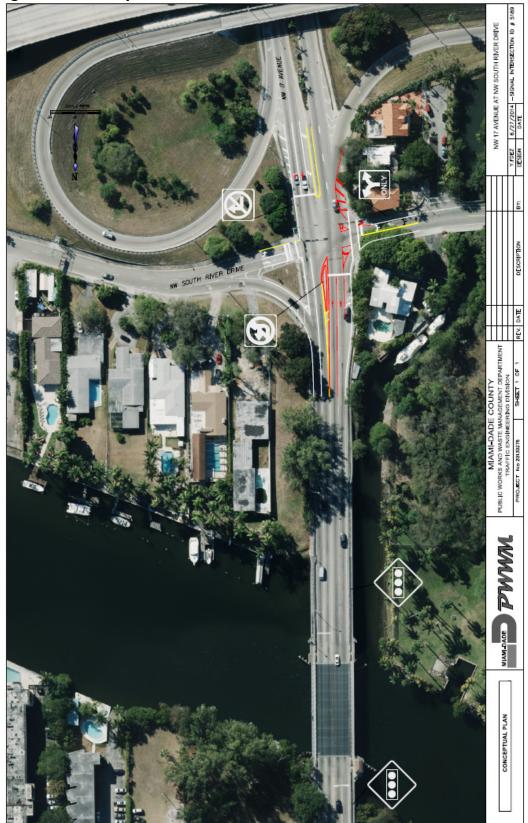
Conceptual Plan – NW 17 Avenue and NW South River Drive
